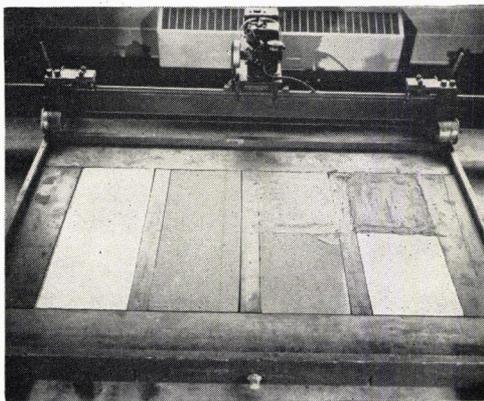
Four 16- by 40-inch base slabs ready for resurfacing. Two middle specimens are dry, two outer specimens are damp; one-half of two specimens has been covered with grout.
